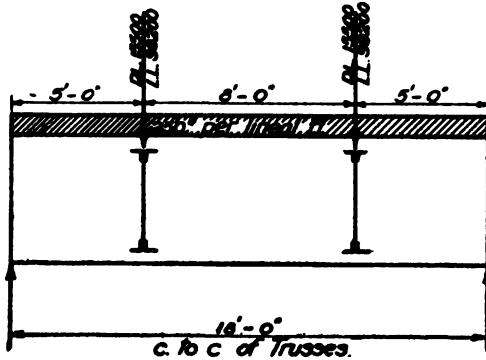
MAXIMUM LOADING ON INTERMEDIATE FLOOR BEAMS
